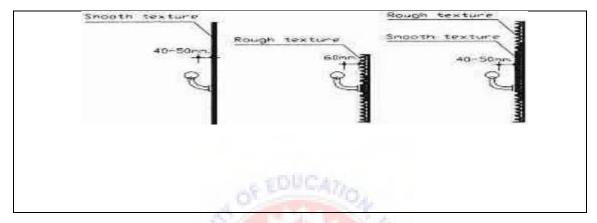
Fixing of handrails on walls (Source: SOLIDERE 2004)
